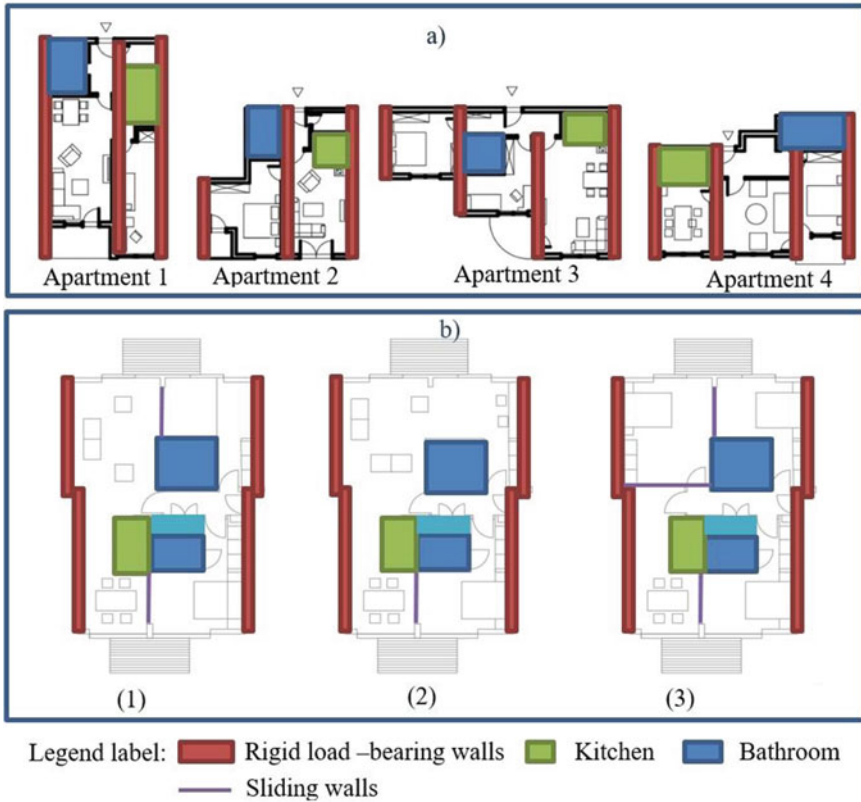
Comparison between newly constructed apartments in Sarajevo and flexible floor plans Greenwich Millennium Village, adapted according to [11]
